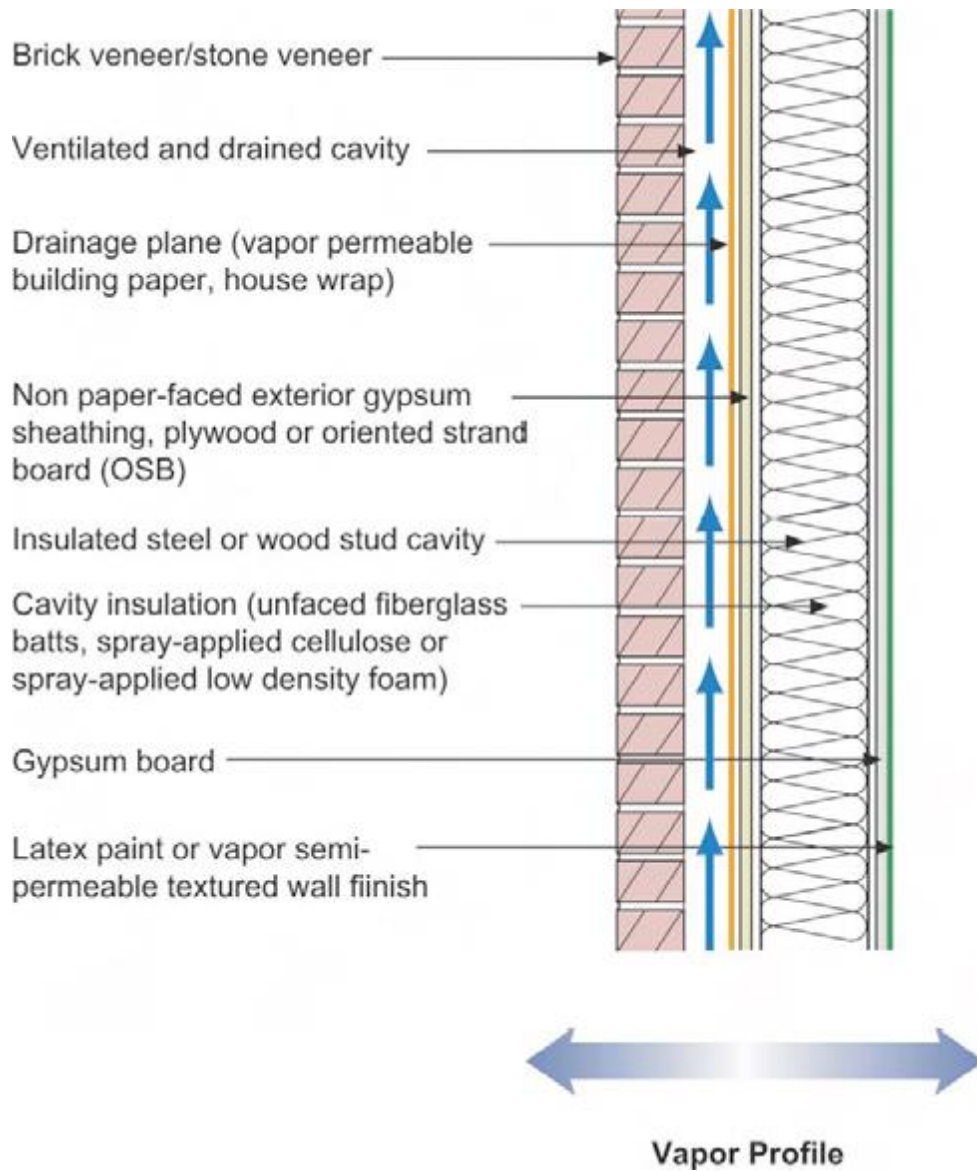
Frame Wall with Cavity Insulation and Brick or Stone Veneer (Joseph, 2005)
